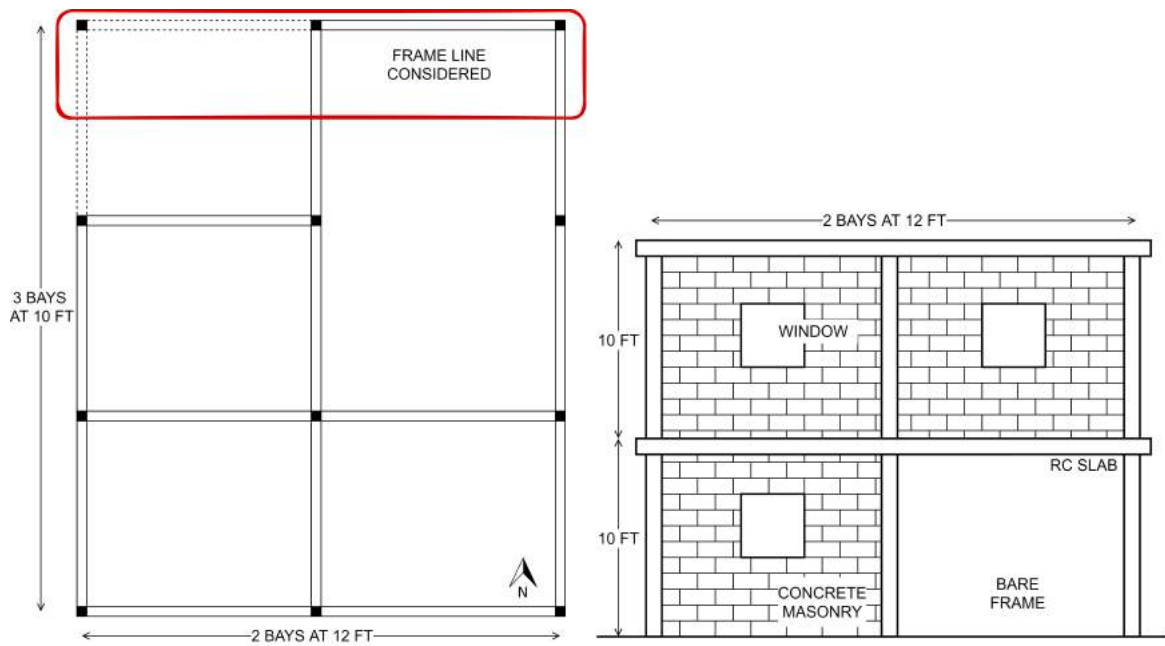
Typical floor plan (showing building frame of interest) and elevation views for archetype houses. The infill configuration and the number of stories are two of the variations considered.
